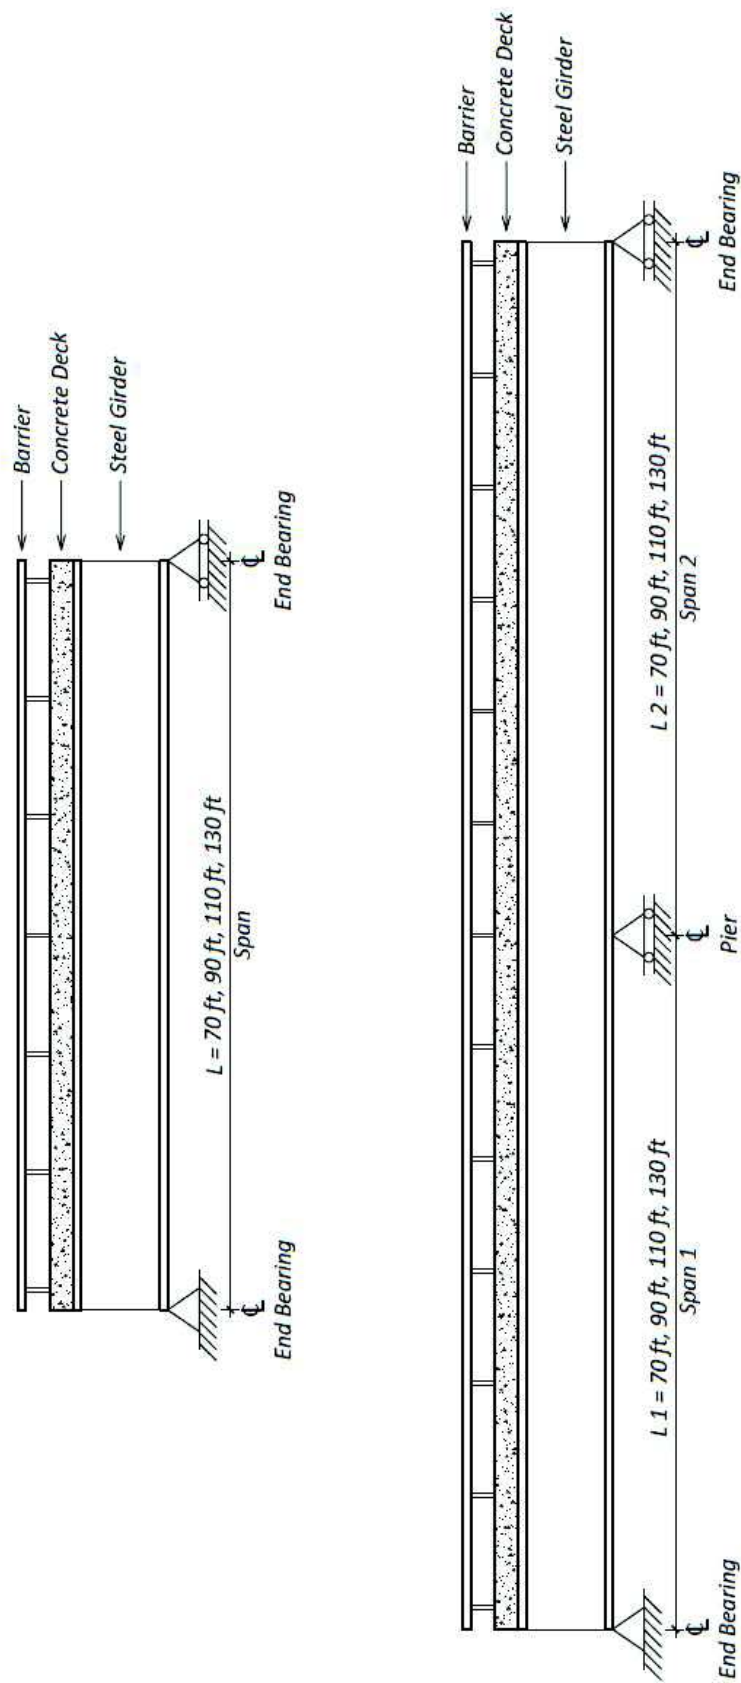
Sketch of longitudinal view for typical one-span and two-span bridges
